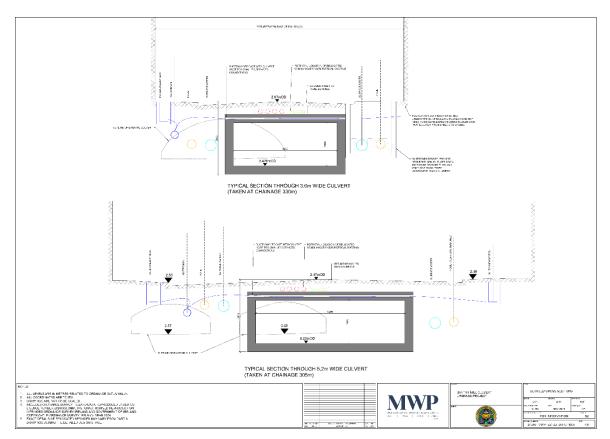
Proposed Bantry Mill Culvert Upgrade Project Sections
